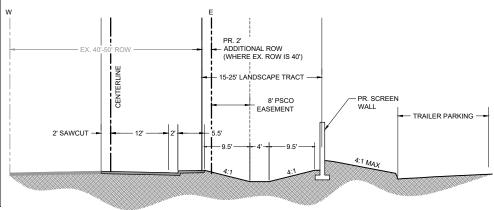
### EXHIBIT D - VALLEJO STREET IMPROVEMENTS
